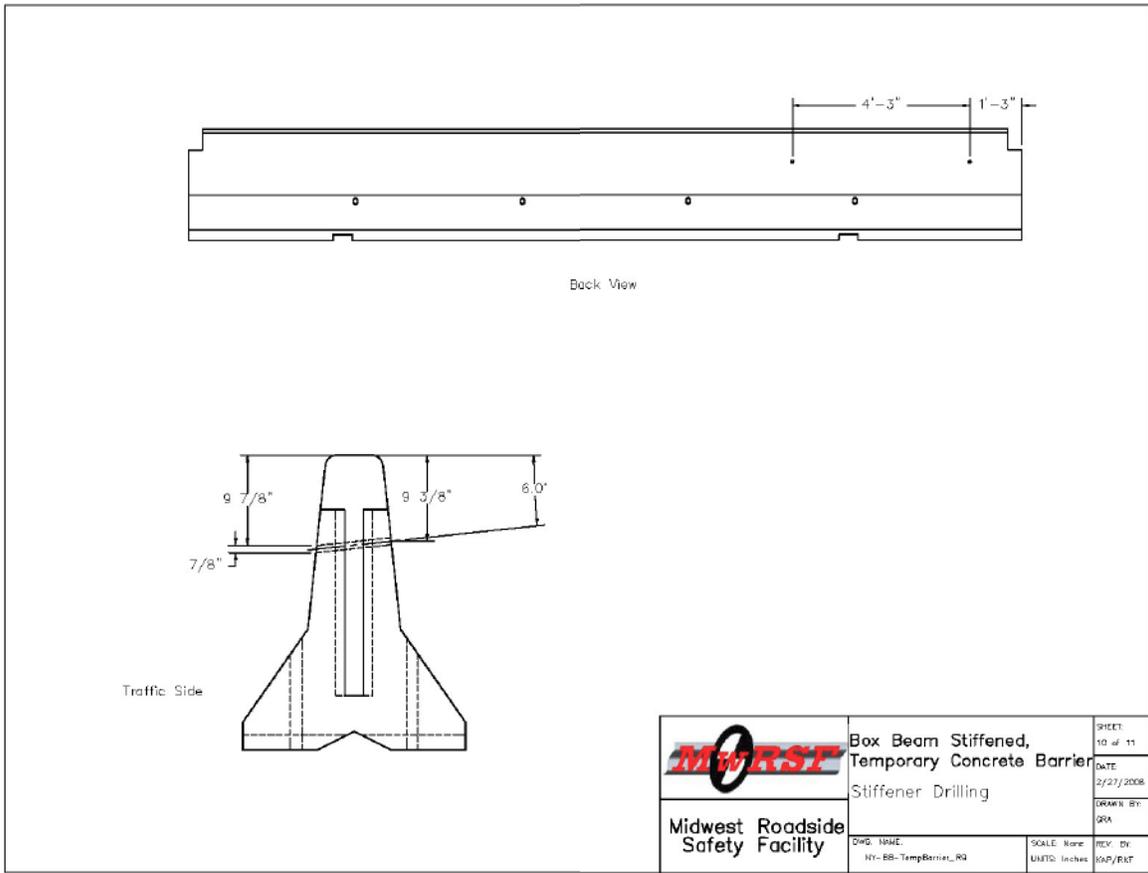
Temporary Concrete Barrier Stiffener Hole Details (English), Test NYTCB-1
